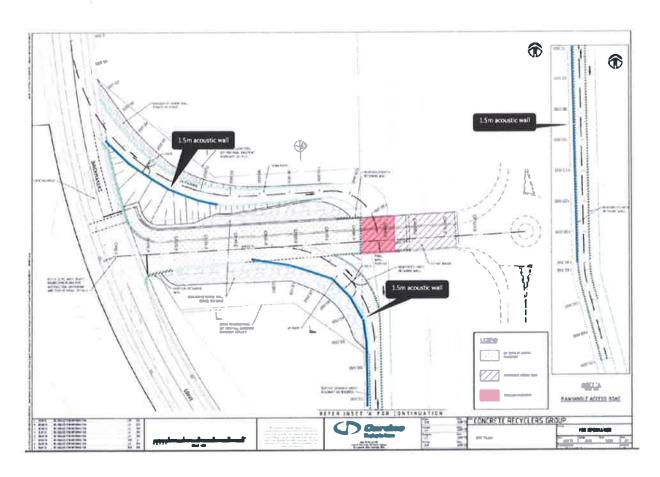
Plan of entry/ exit ramps and bridge as per the PAC approval 2015 (Source Cardno 2015)
